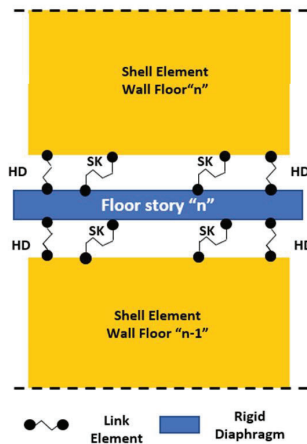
Schematic of FE model for CLT shear walls at the story "n"
